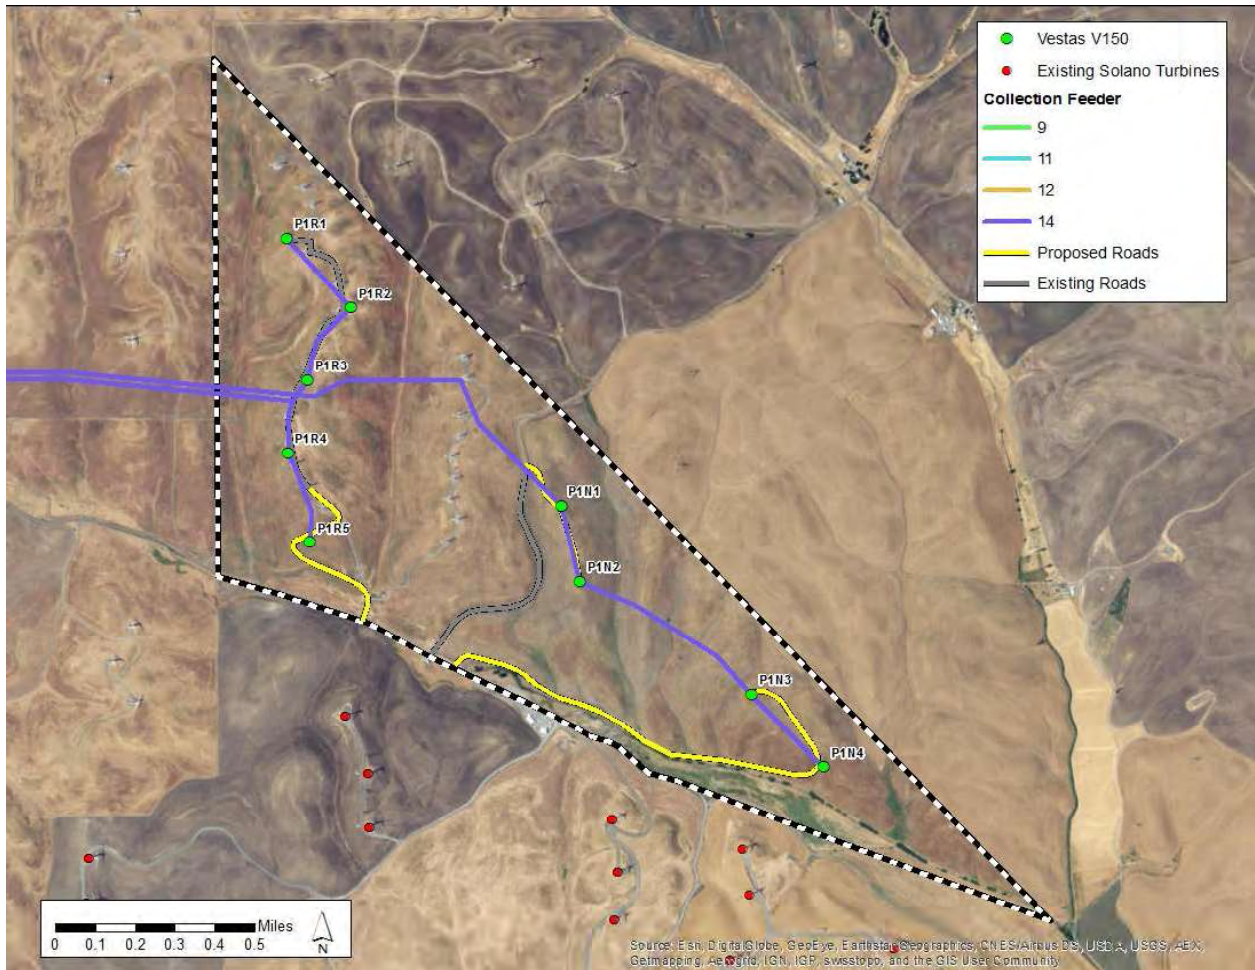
Vestas V150-4.20 Phase 1 Road and Collection Routing
